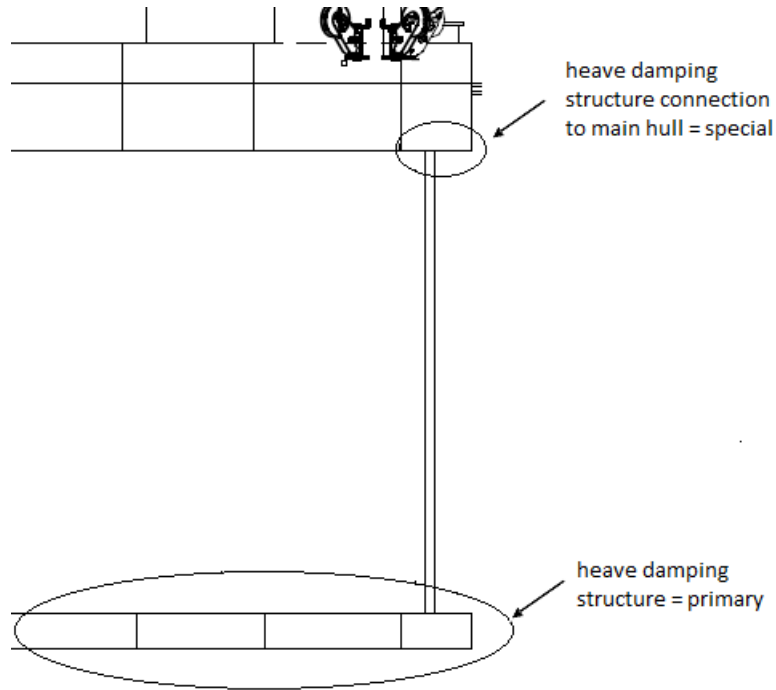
Example of structural categorisation of heave damping structure of a typical DDF
